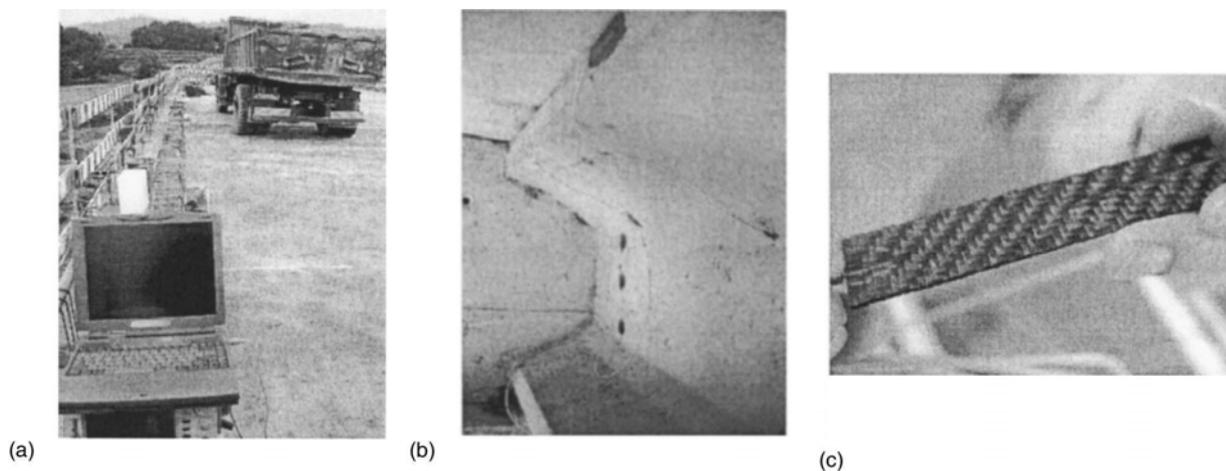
(a) Static Loading Test; (b) Sensors Applied in a Beam;
